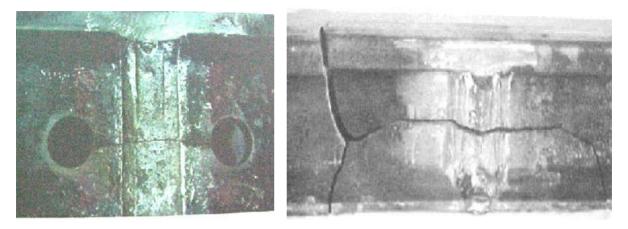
422 - WELDING, THERMIT JOINT HORIZONTAL CRACK
